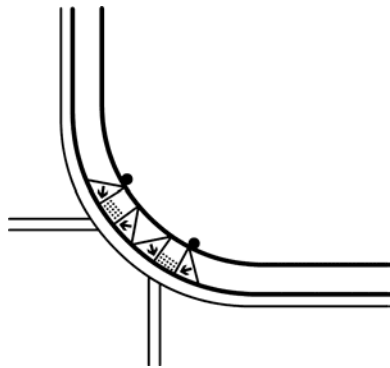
Acceptable APS placement, but inaccessible ramp design (no level space for passage through the sidewalk).
